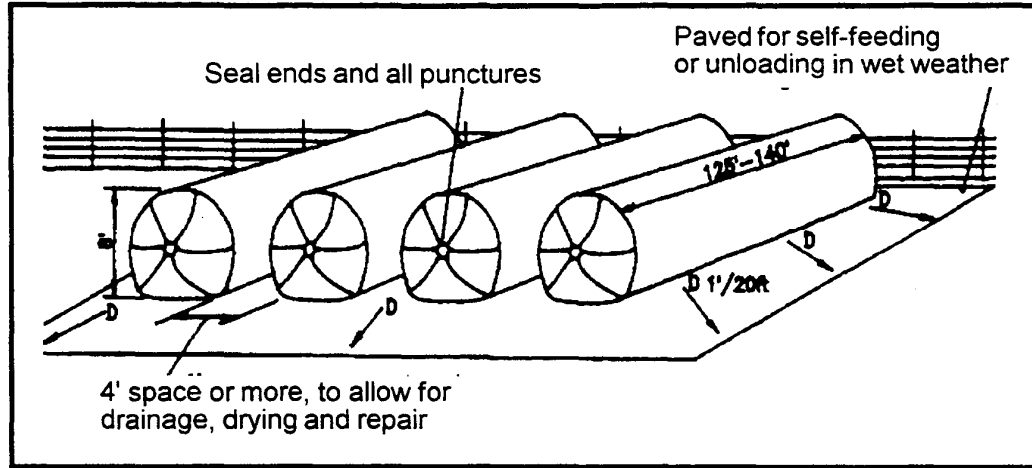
Horizontal silo. Source: *Beef Housing and Equipment Handbook*, MWPS-6, Fourth Edition, 1987, Midwest Plan Service, Ames, Iowa.
